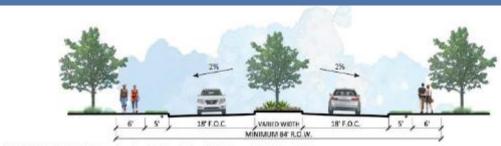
A: Divided Collector Roadway Design Option A (Minimum 84' Right-of-Way)
